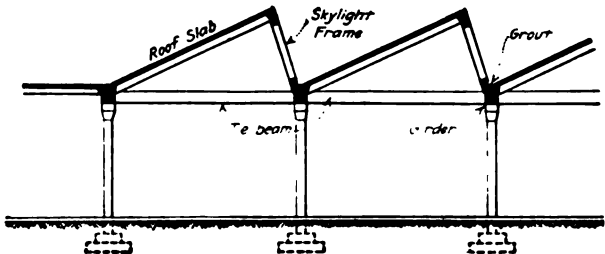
Cross-section showing typical arrangement of units in sawtooth construction, Unit-bilt system
